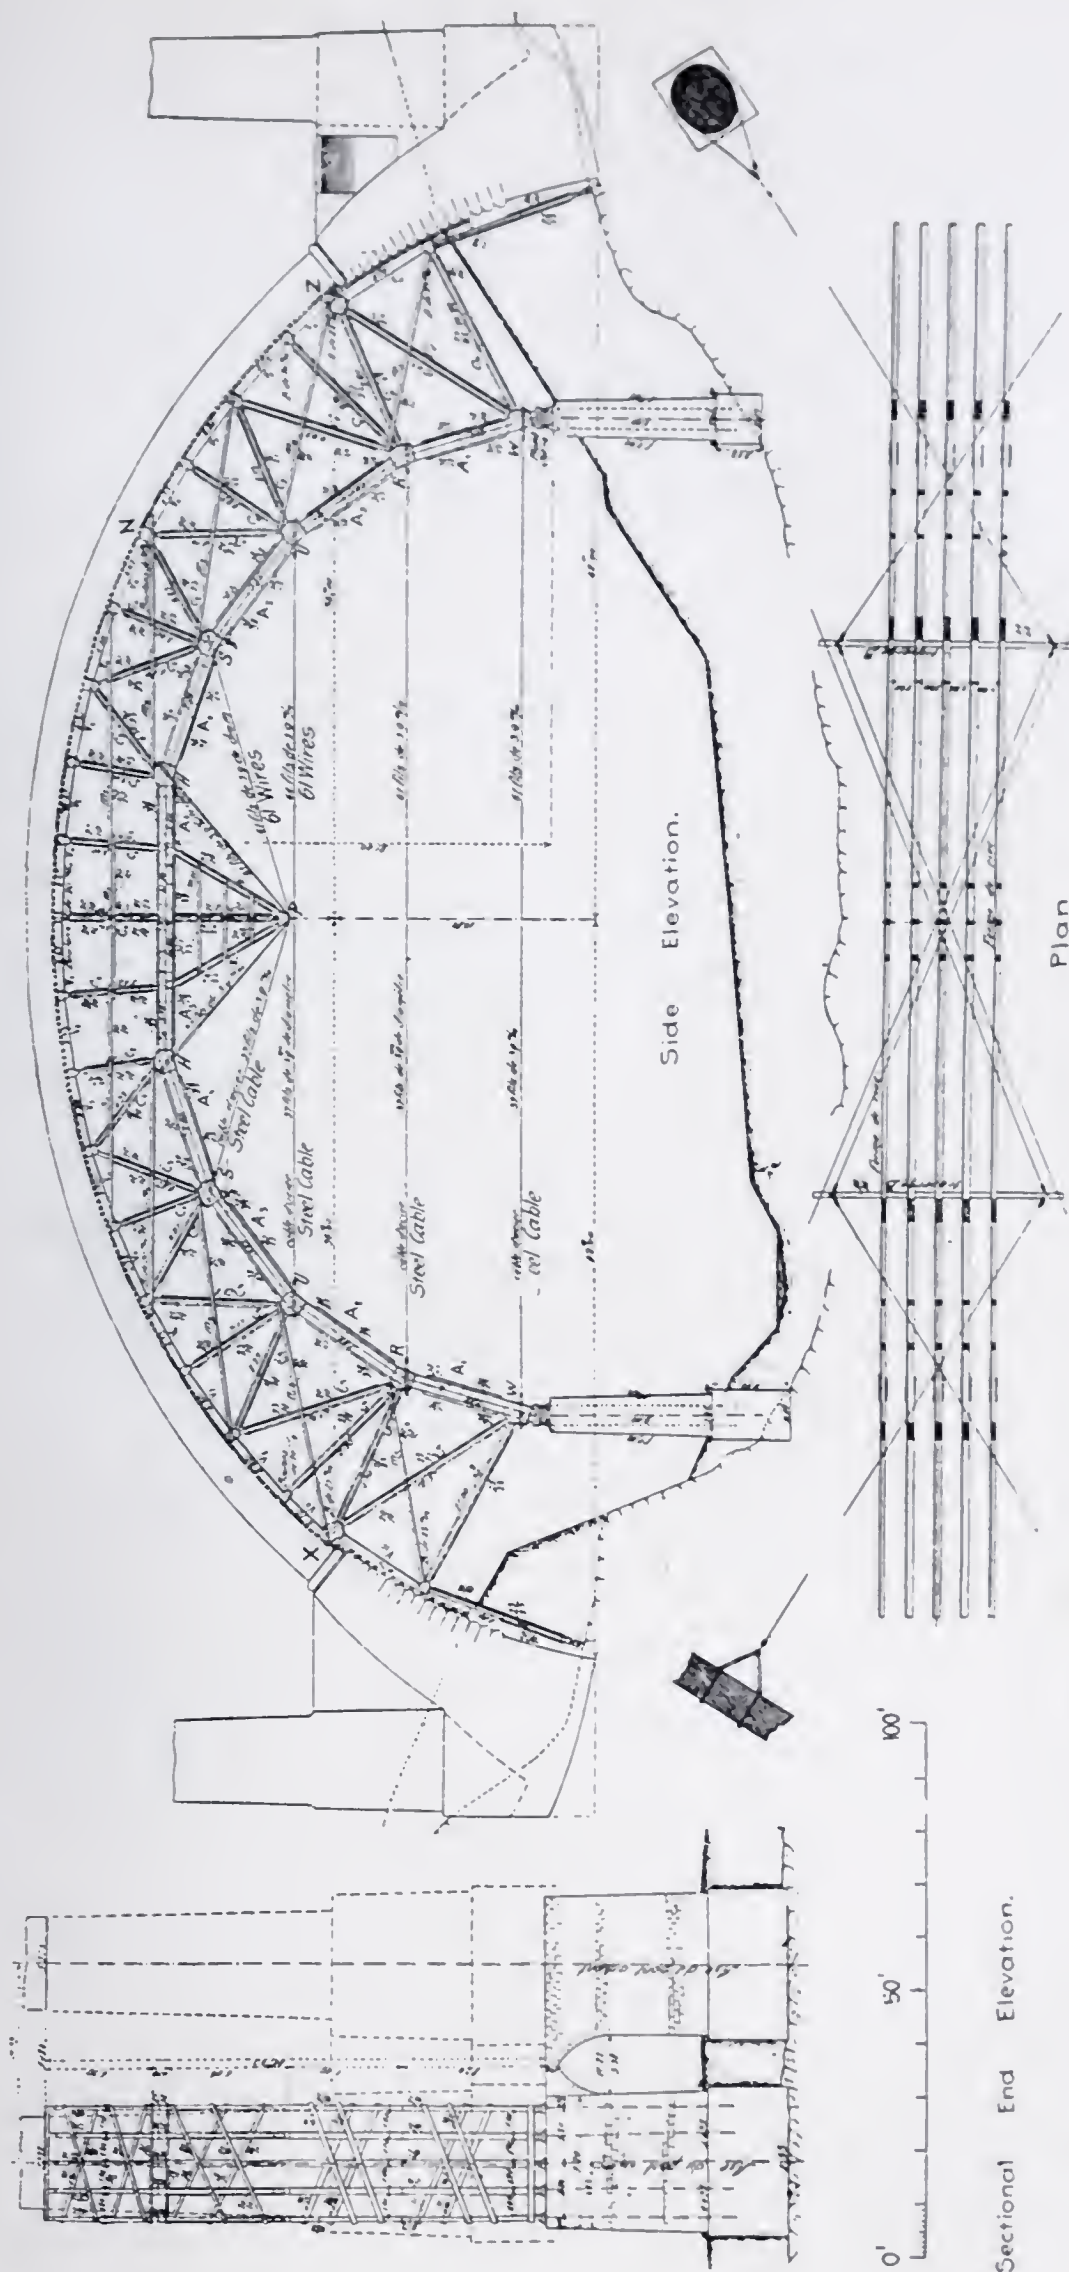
CENTERING FOR THE LUXEMBURG STONE ARCH BRIDGE.
